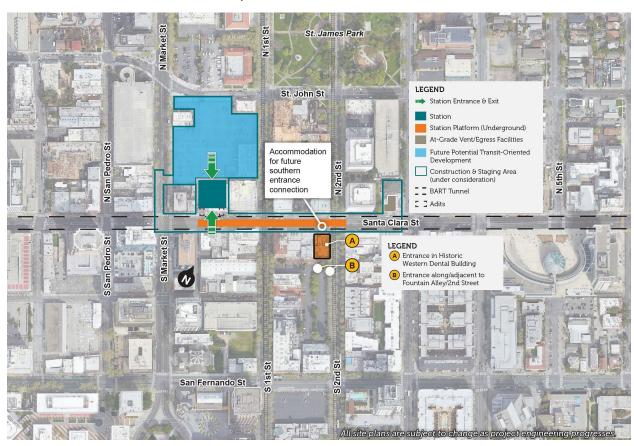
Downtown San José BART Station Site Plan with Future South Entrance Connection
